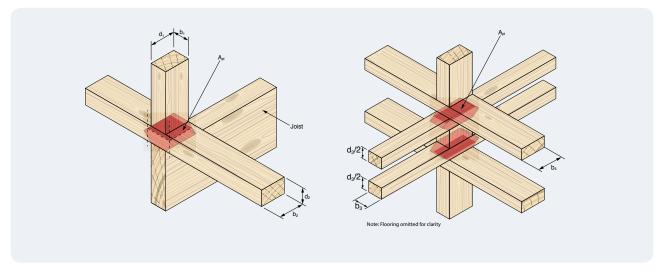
Bearing in top plate (left) and top and bottom floor truss (right).
